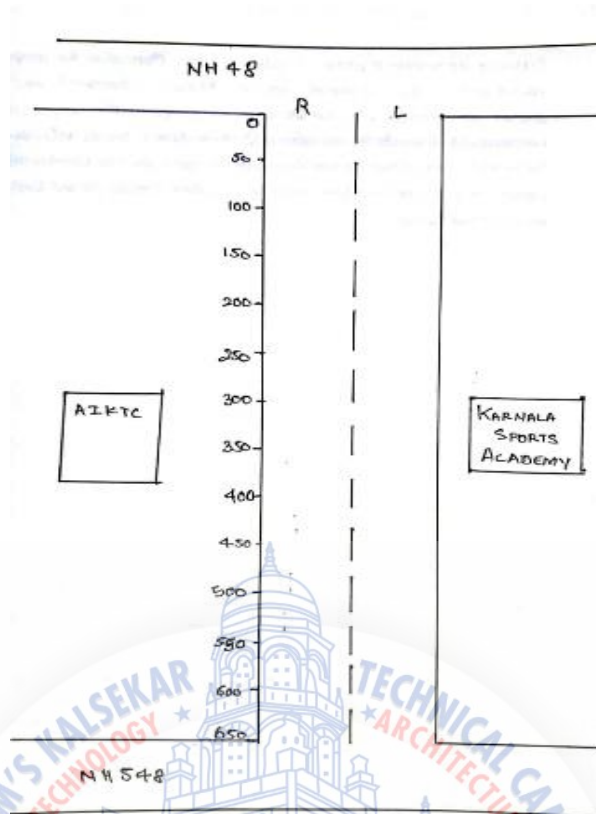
Layout of sections of pavement for Structural Evaluation of Pavement
